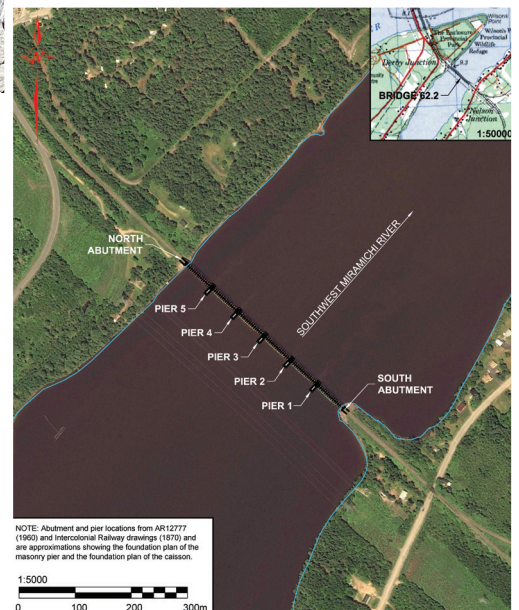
General arrangement of the CN Rail bridge crossing the Southwest Miramichi River (GEMTEC 2016).
